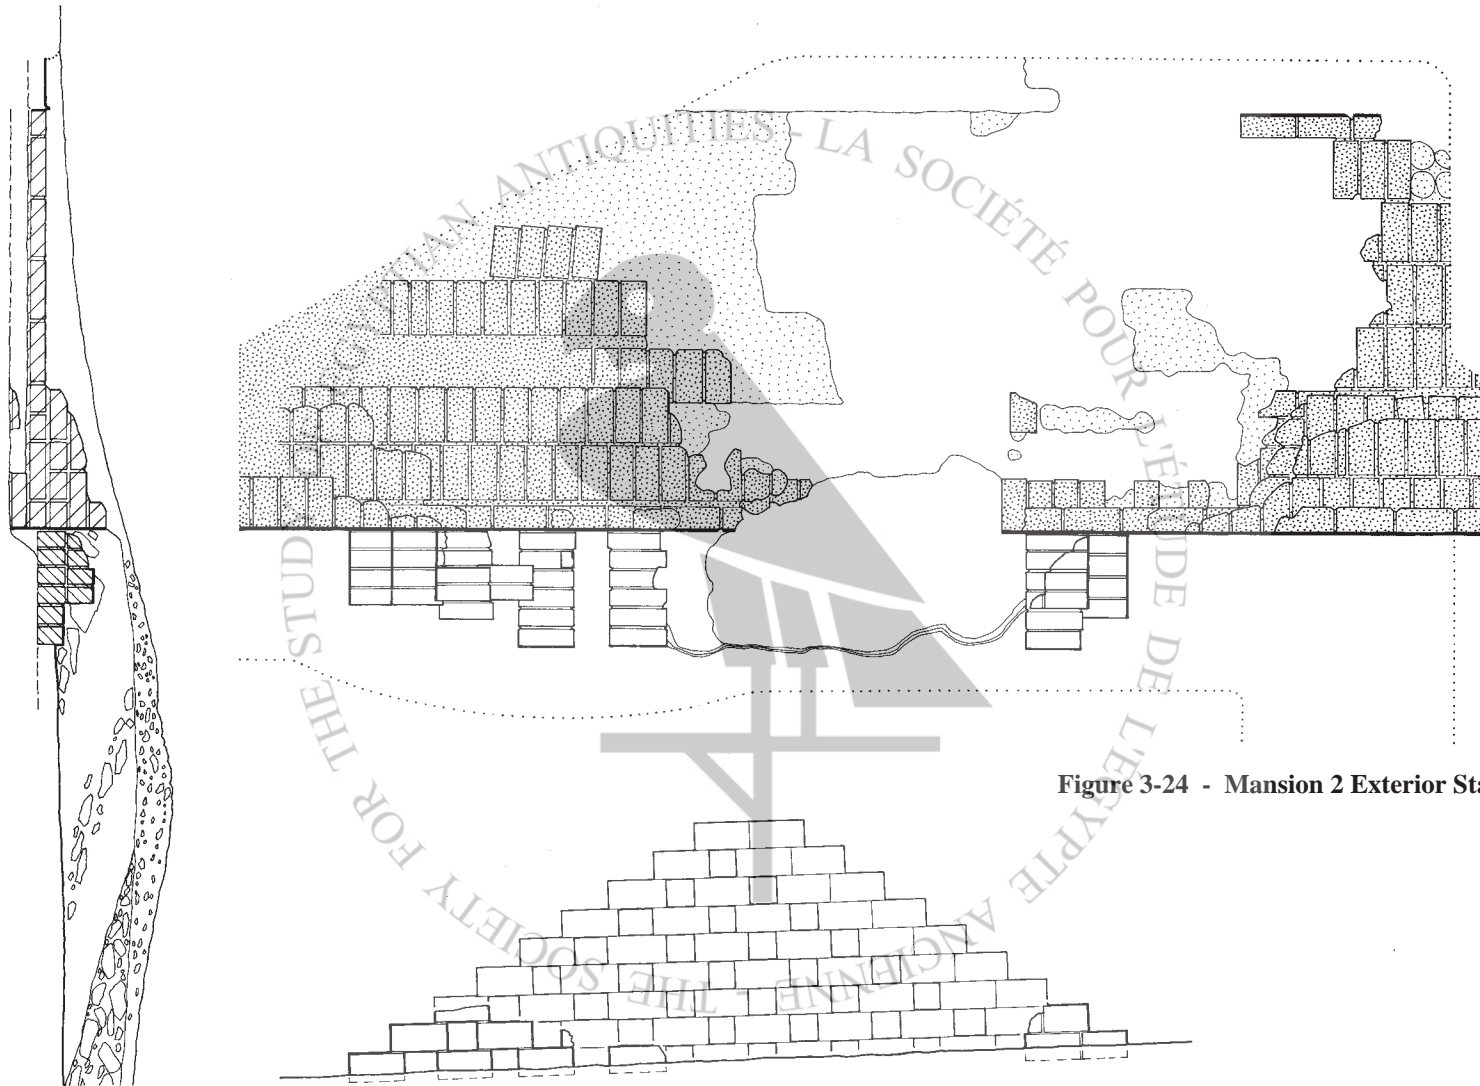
Mansion 2 Exterior Stairs: Plan.
